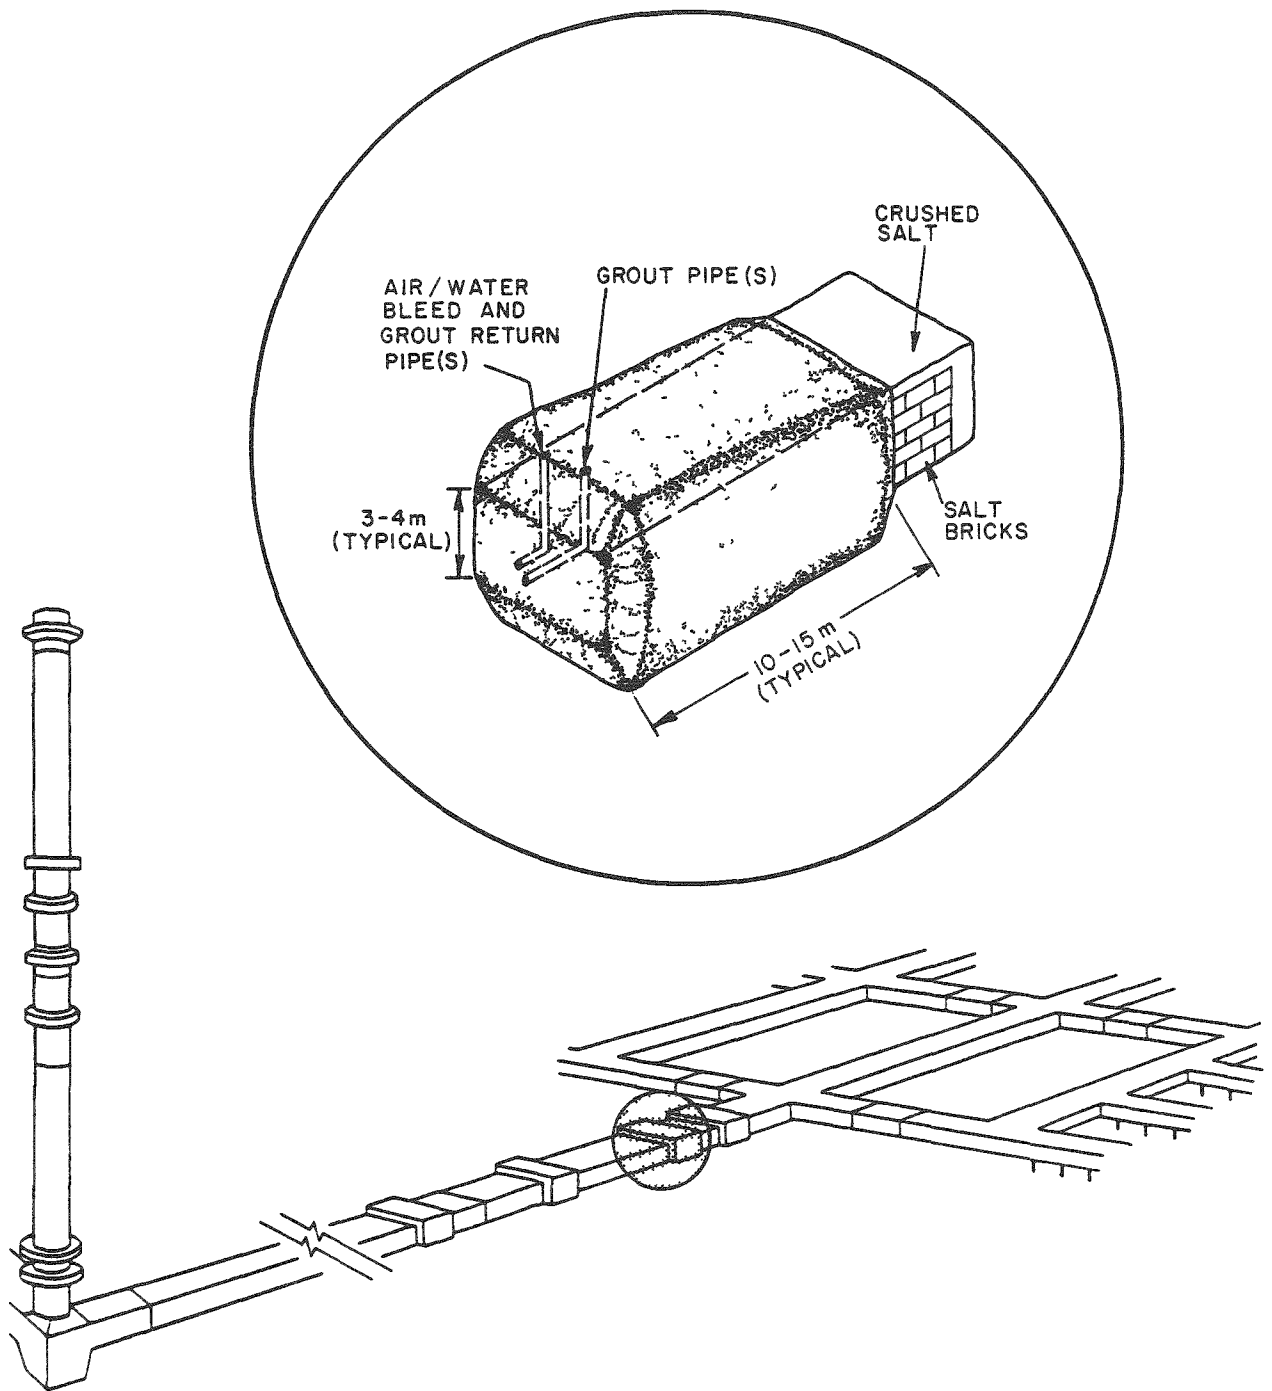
Concept for Concrete Tunnel Bulkheads - Salt Repository
